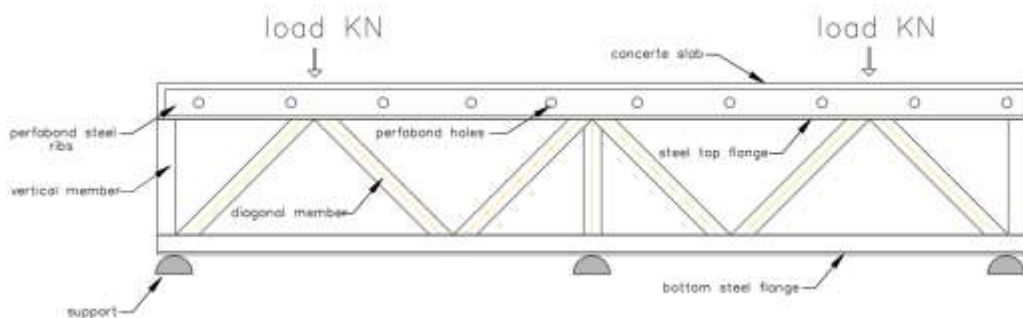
Girder Test of Shear Connectors Under Two Points of Load
